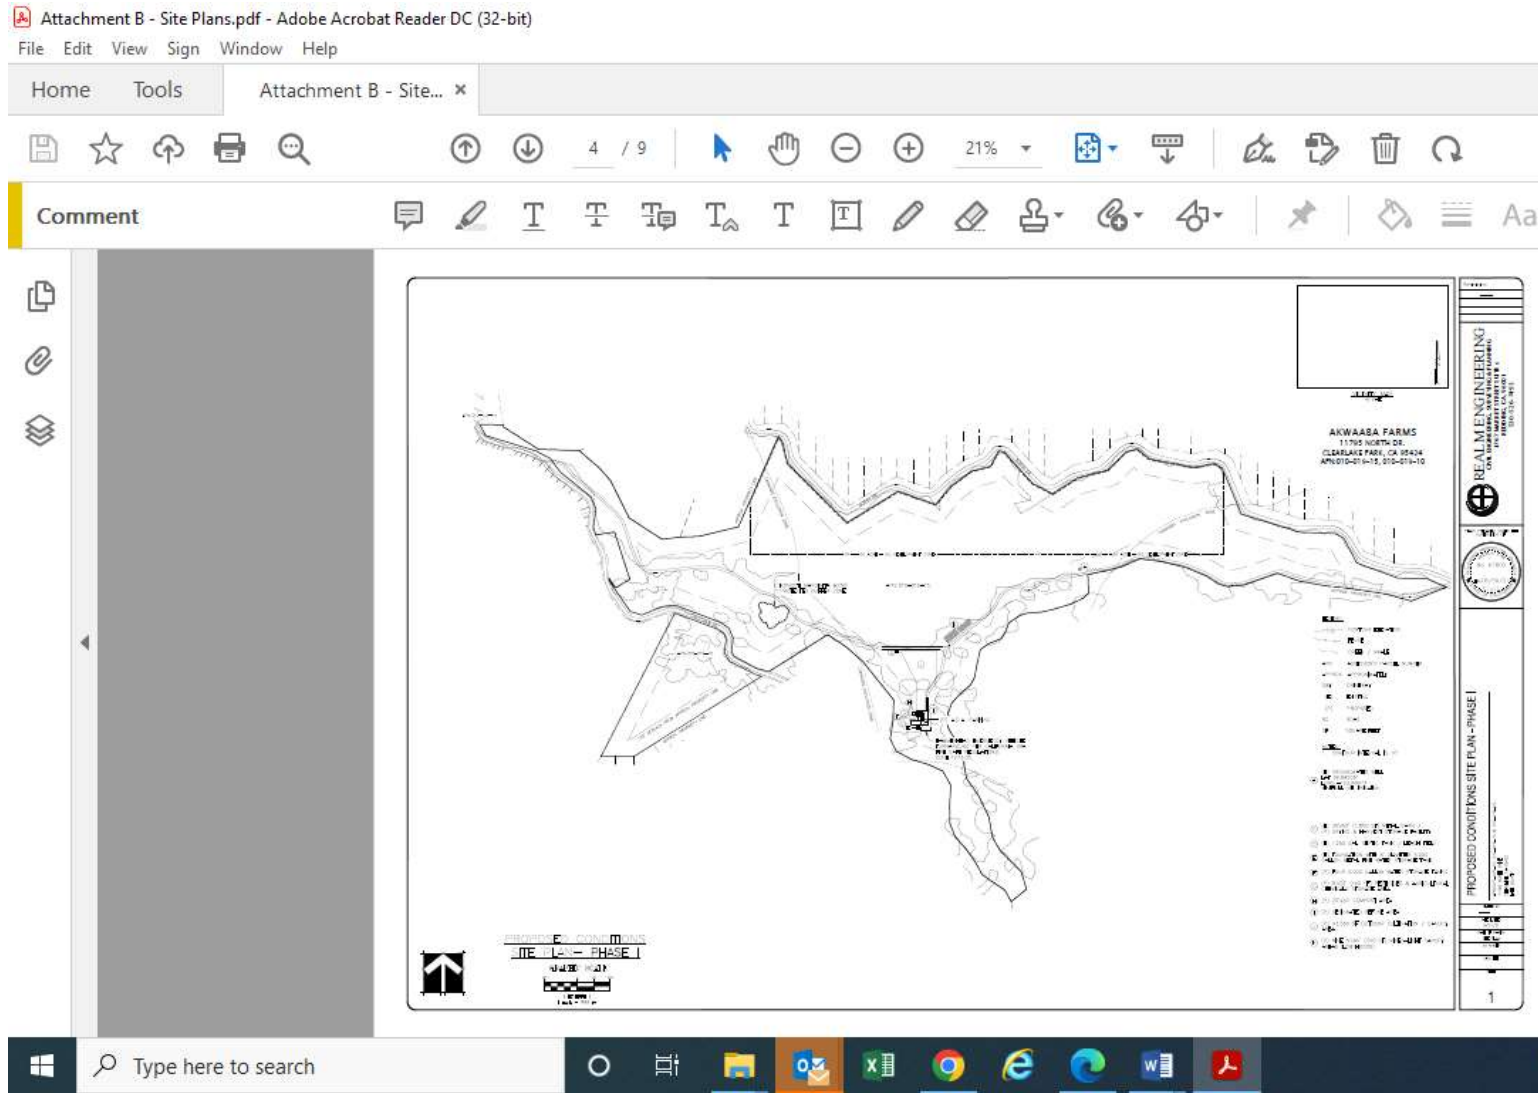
Akwaaba Farms Proposed Conditions Site Plan
